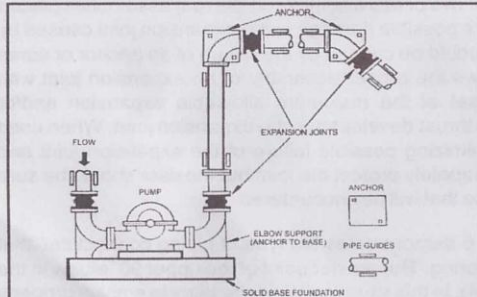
Typical Piping Layout Utilizing Expansion Joints When Equipment and Piping are Properly Anchored
